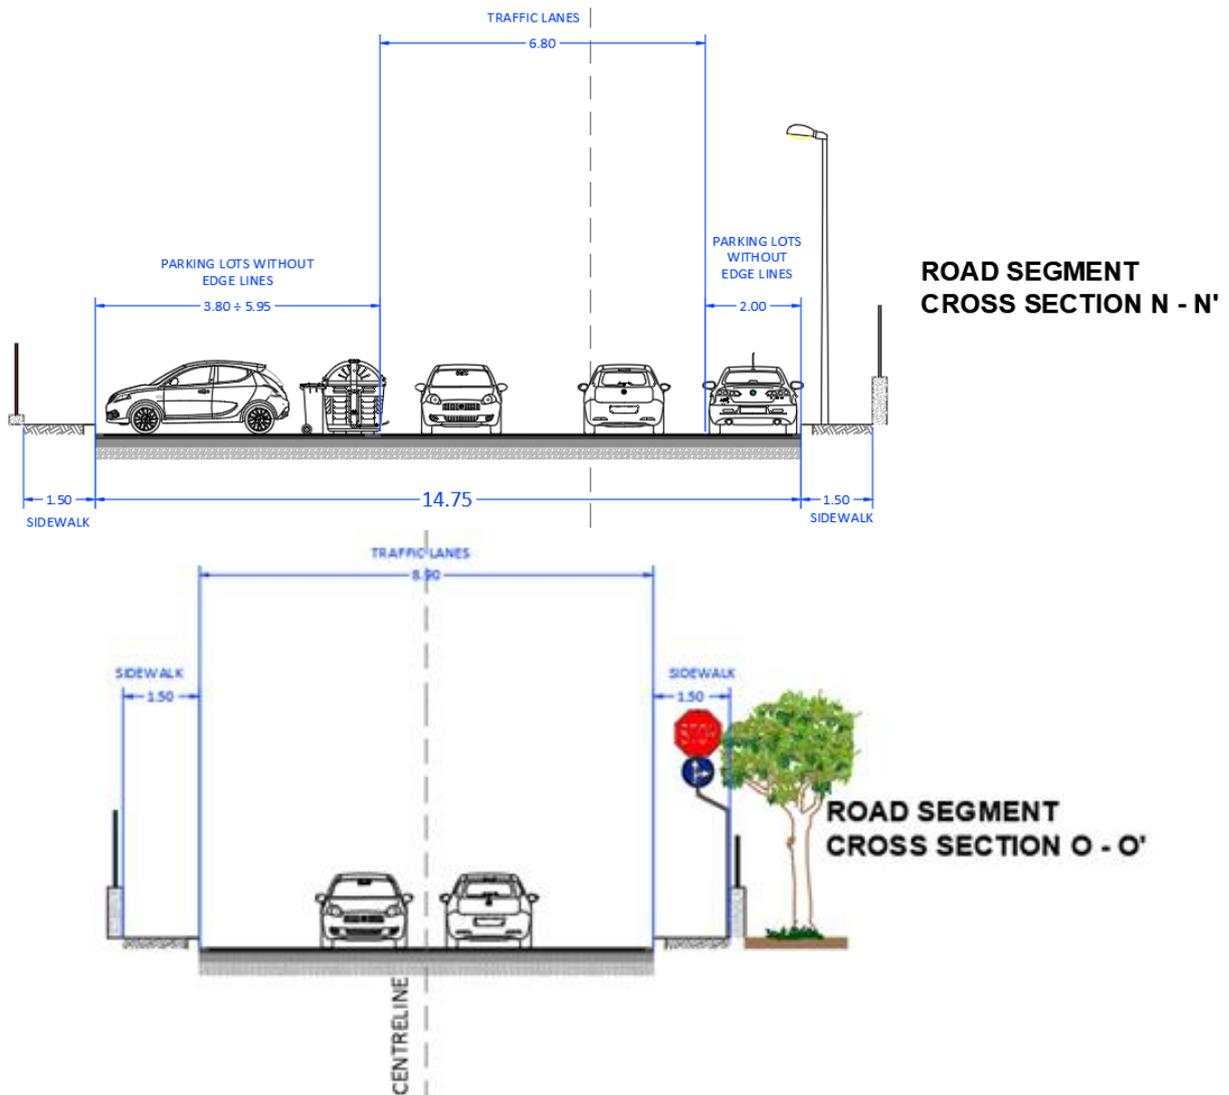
Cross section, road segment sections – Via Niceforo.
